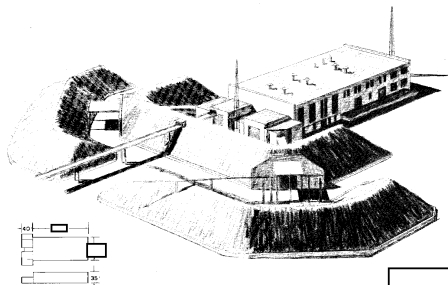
POSSIBLE PROPELLANT PREMIX BUILDING (item 34, Figure 3).
